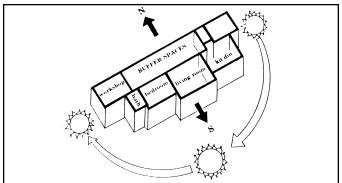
The floor plan should be designed so that living spaces are compatible with the sun's path.
